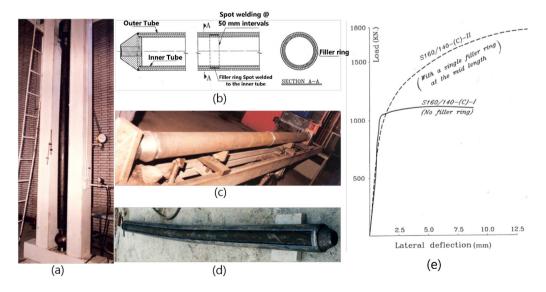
a) Test setup, b) The proposed tube-in-tube member consisting of double CHS tubes with intermediate filler ring(s) to replace the unavailable single tube section, c) The installation of the intermediate ring on the internal tube, d) Buckled tube-in-tube member without intermediate ring cut along the length of the outer tube, e) Load - lateral deflection relationship for tube-in-tube members with and without a contact ring at the mid-length (after Maalek [13]).
